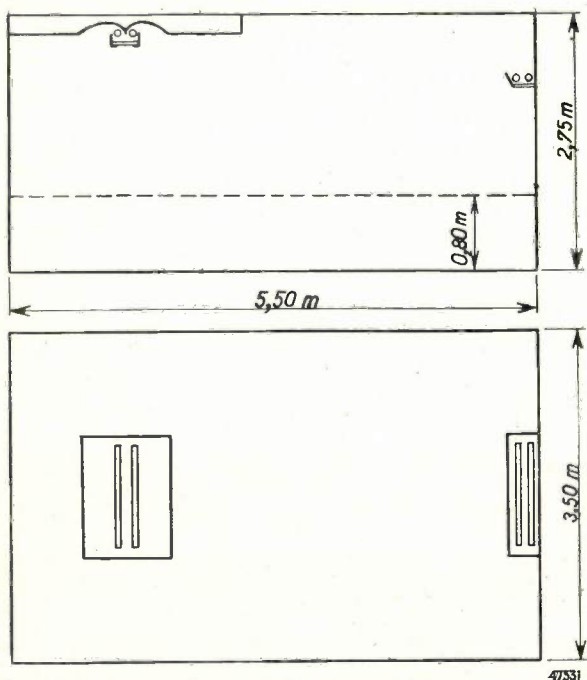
Plan and elevation of the test room with the two fittings: one let into the ceiling (which was somewhat lower over one half of the room) and one in a cornice on the narrow wall of the room.
